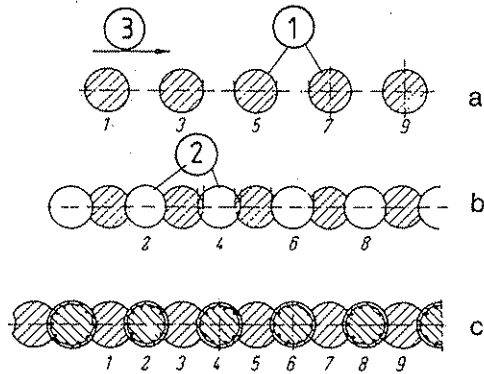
Diaphragm of intersecting piles, construction scheme.
